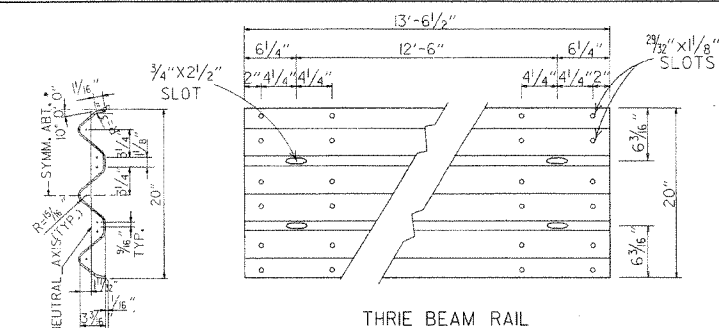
DETAILS SHOWING POSITION OF GUARD RAIL ON HIGHWAY
